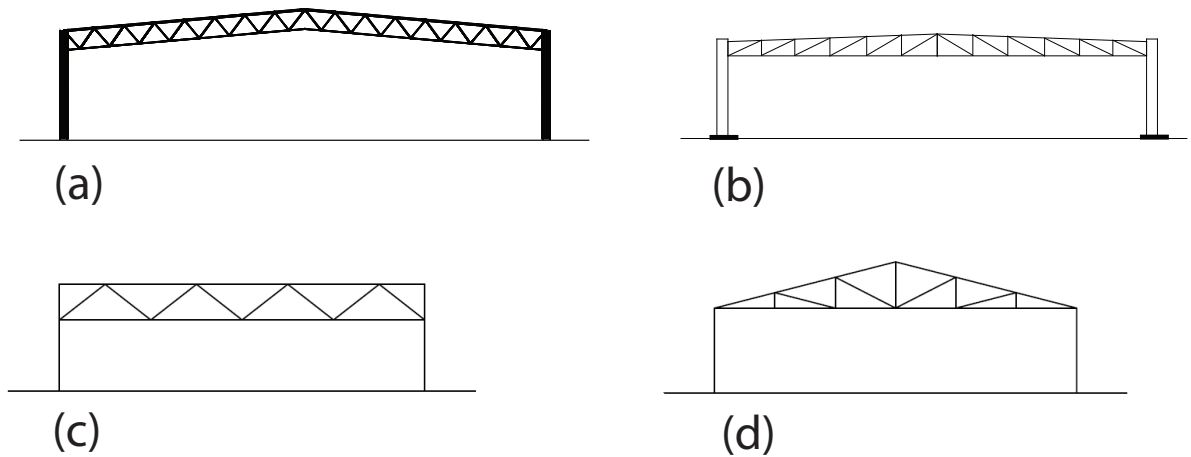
Different types of truss frames: (a) portalised truss roof, (b) typical truss roof, (c) warren truss roof and (d) pitched truss roof (Woolcock *et al.* 1993, and Simms and Newman 2002).
